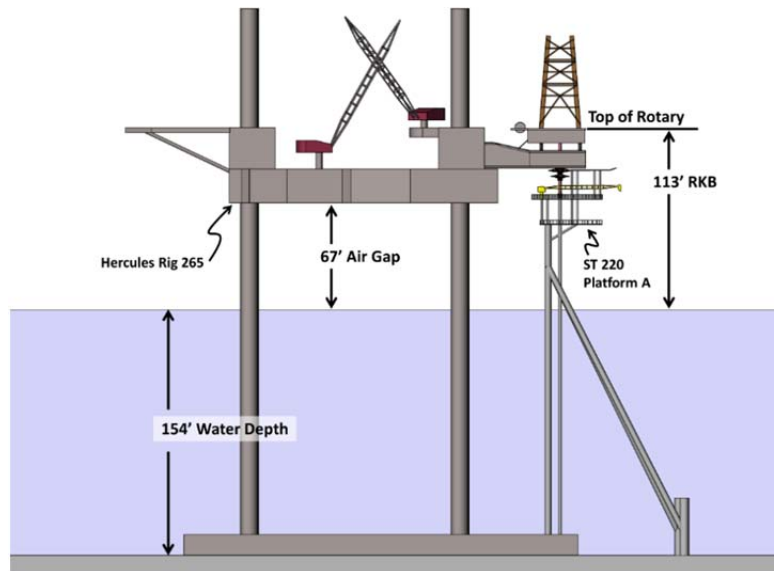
Elevations for Hercules 265 on location at ST 220 A3
